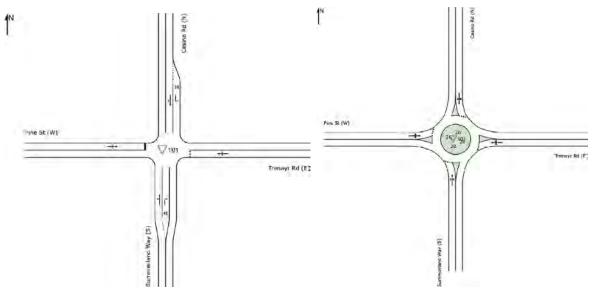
SIDRA Intersection Layout of Summerland Way / Trenayr Road / Pine Street (Intersection 7) – Existing Layout (left) and Proposed Upgrade (right)
